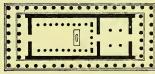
Peripteral Octastyle Arrangement of Columns.
